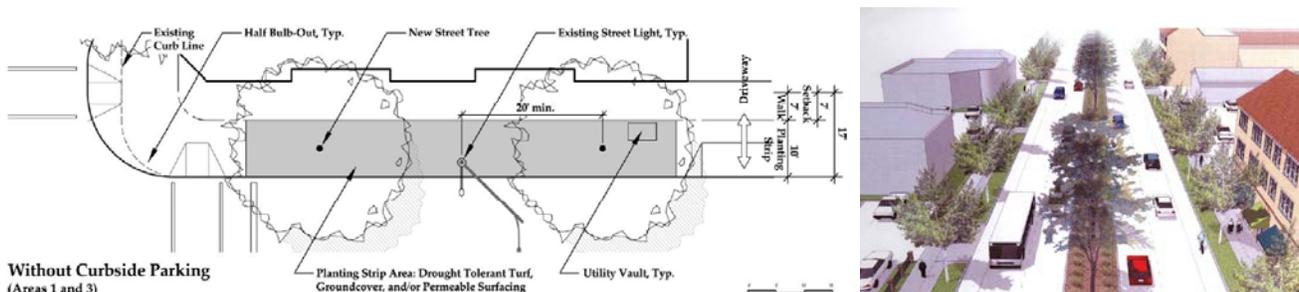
& 5: Winchester Boulevard Master Plan Streetscape Standards
